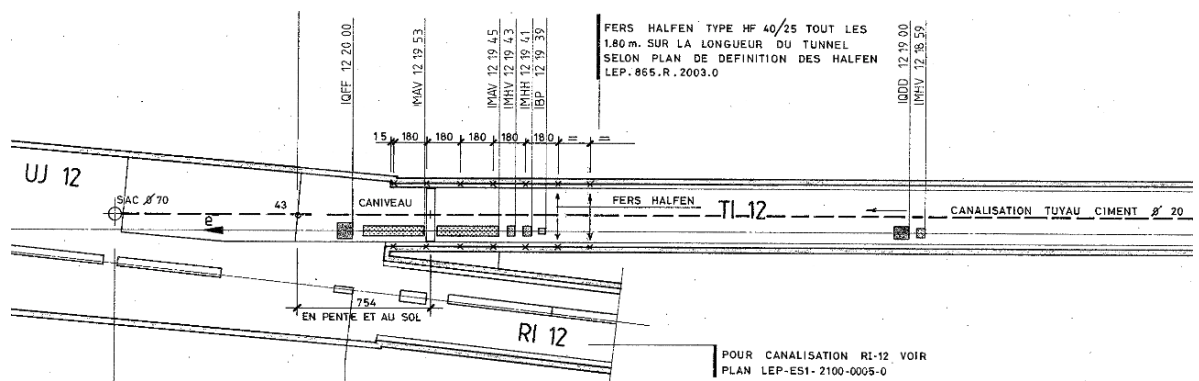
As-built plan view of tunnel showing arrangement of existing drainage infrastructure.
